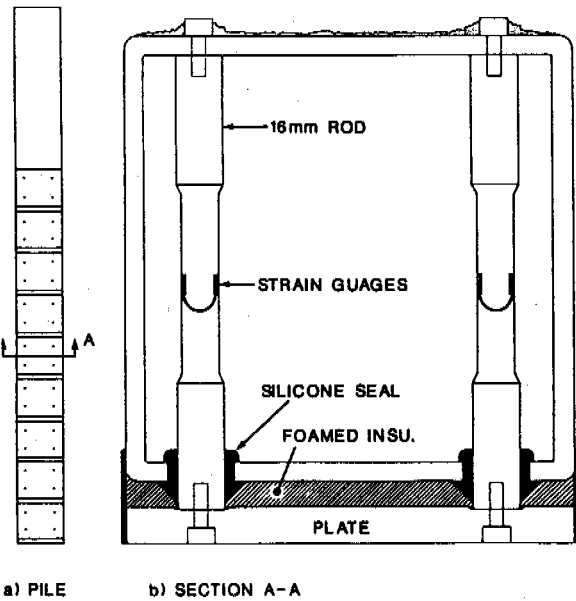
(a) Instrumented pile; (b) details of plate load cell.
